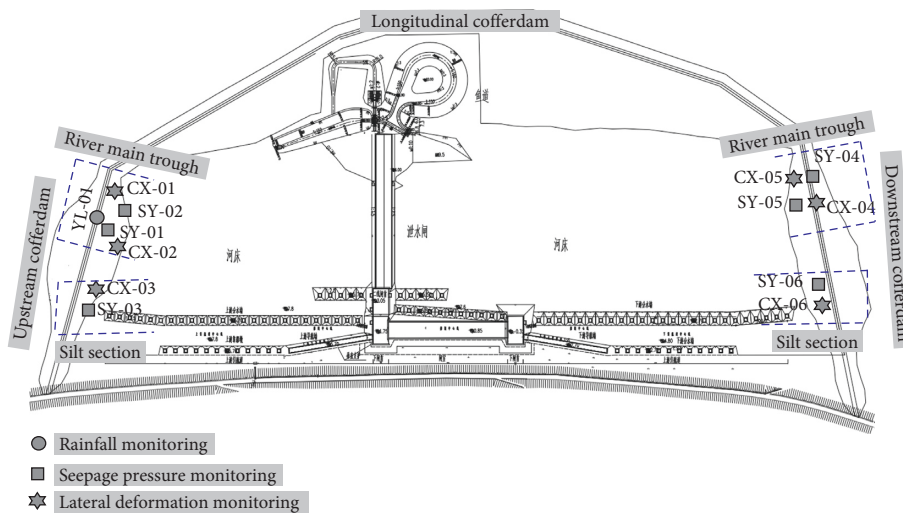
Schematic layout of cofferdam slope monitoring points.
